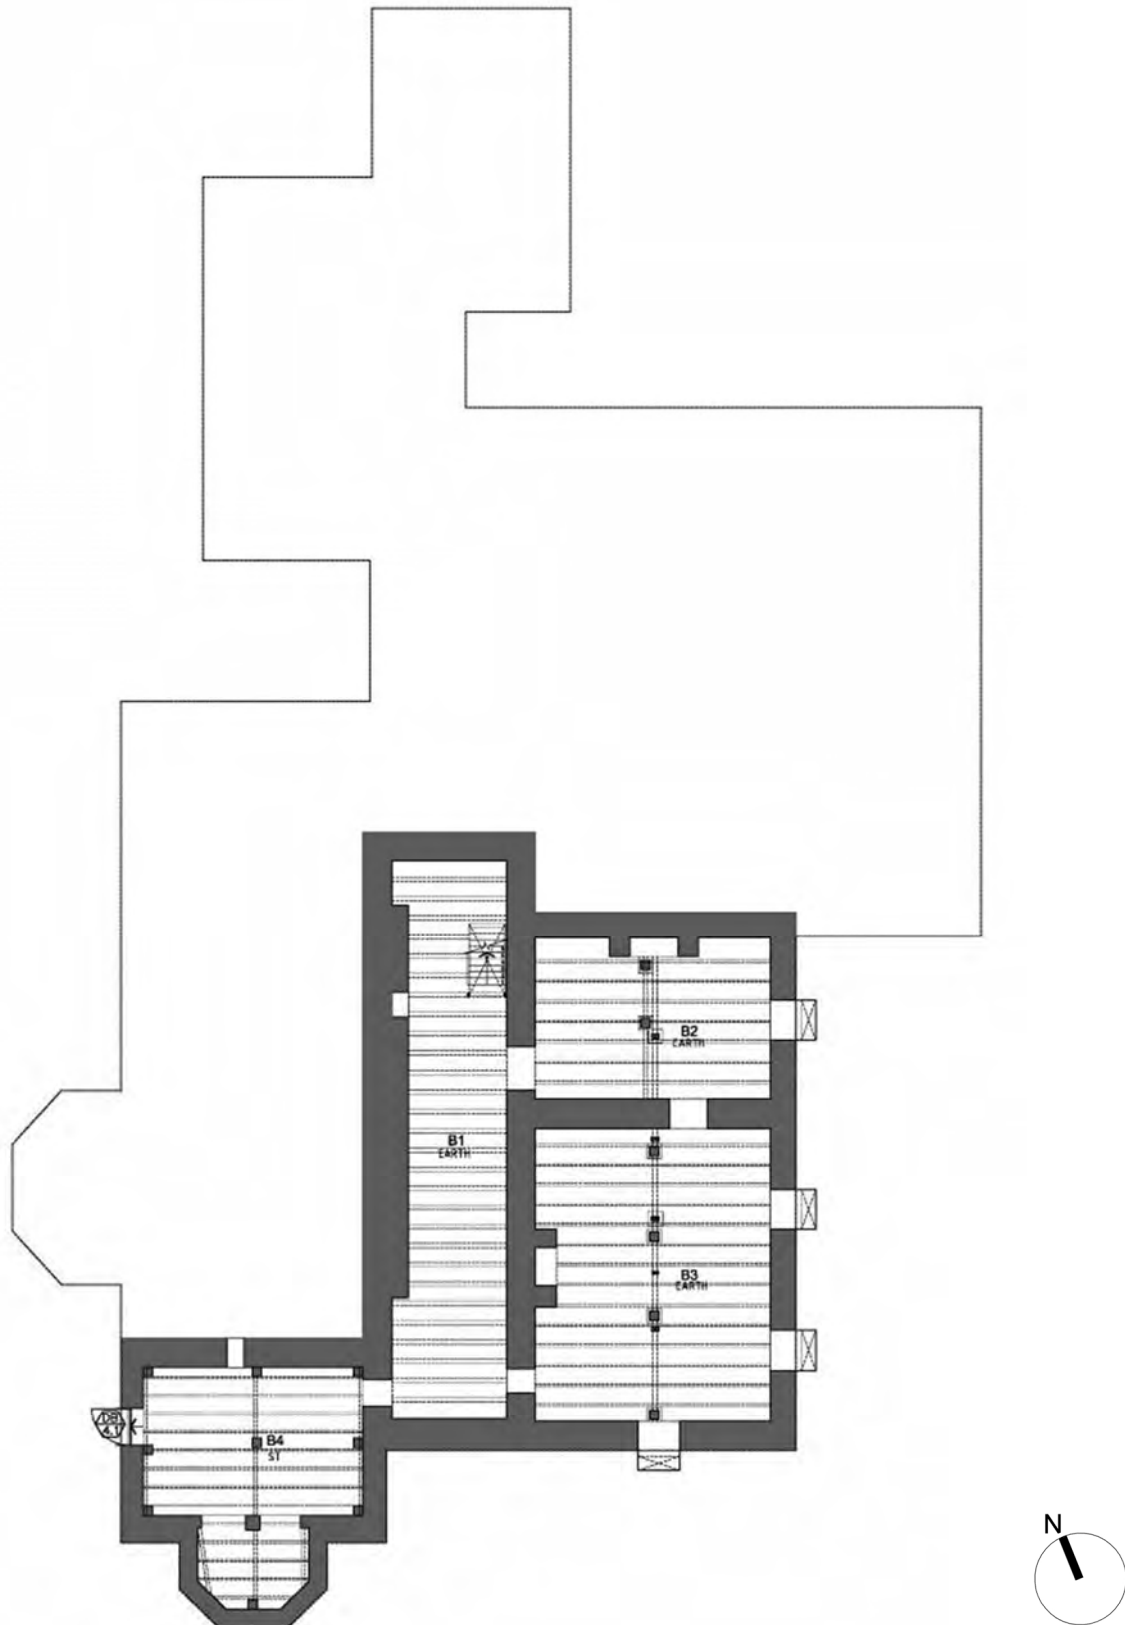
Basement plan for the house complex showing the extent of excavation for the house.
